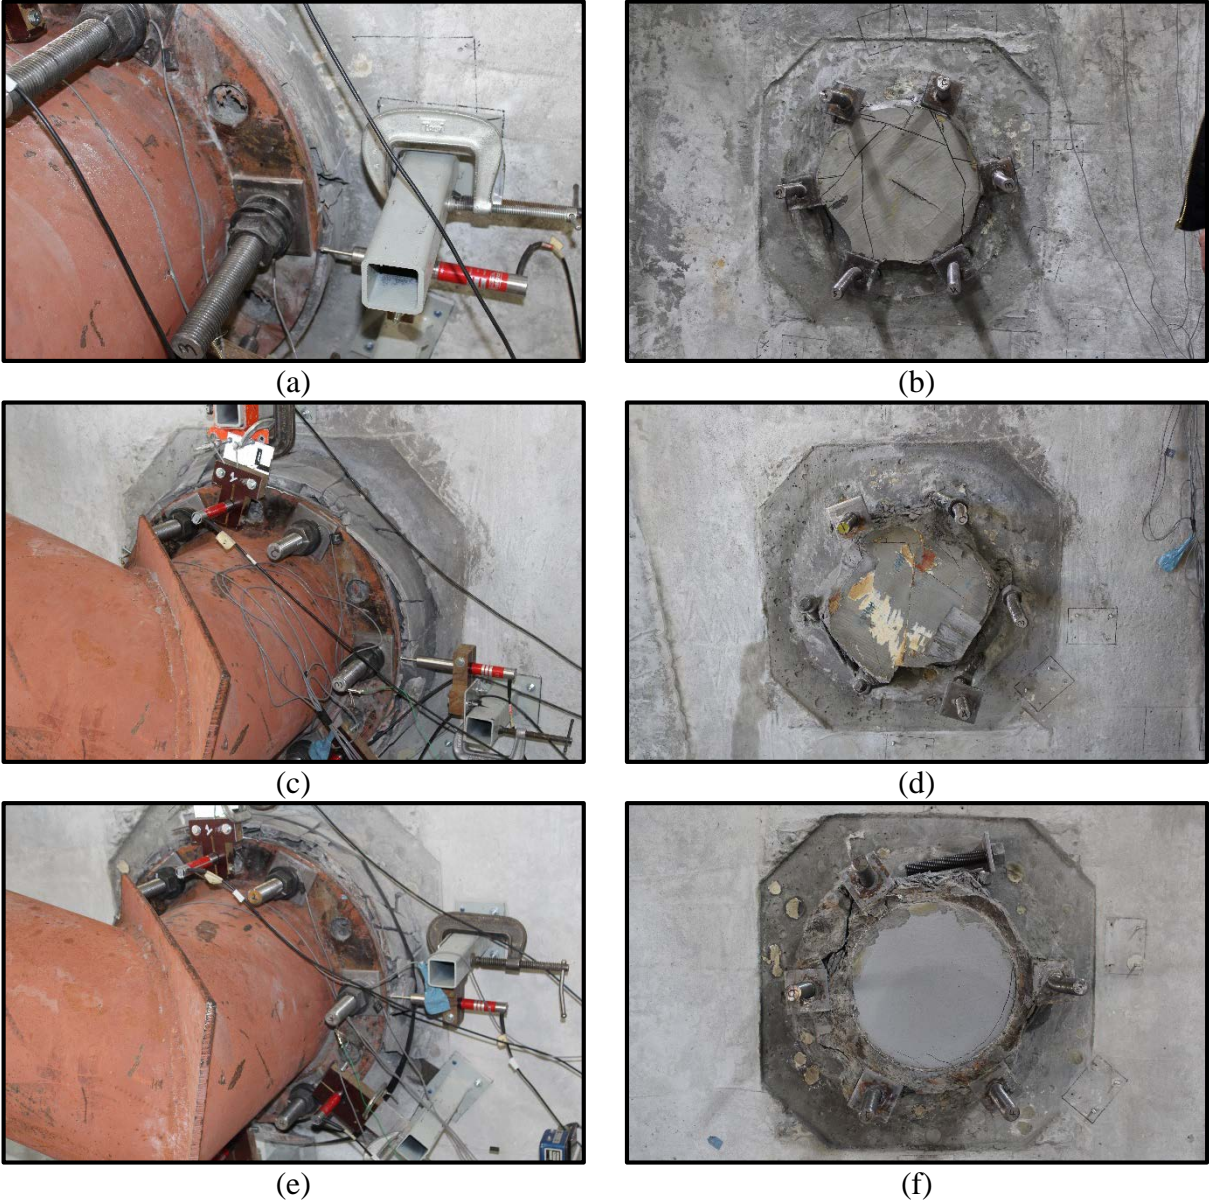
(a, c, e) In-test grout cracking and (b, d, f) post-test grout surfaces for FS2, FS3, and FS4
